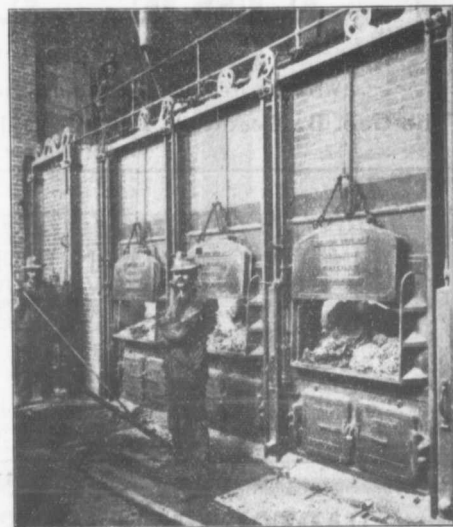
FRONT VIEW OF WESTMOUNT REFUSE DESTROYER.
